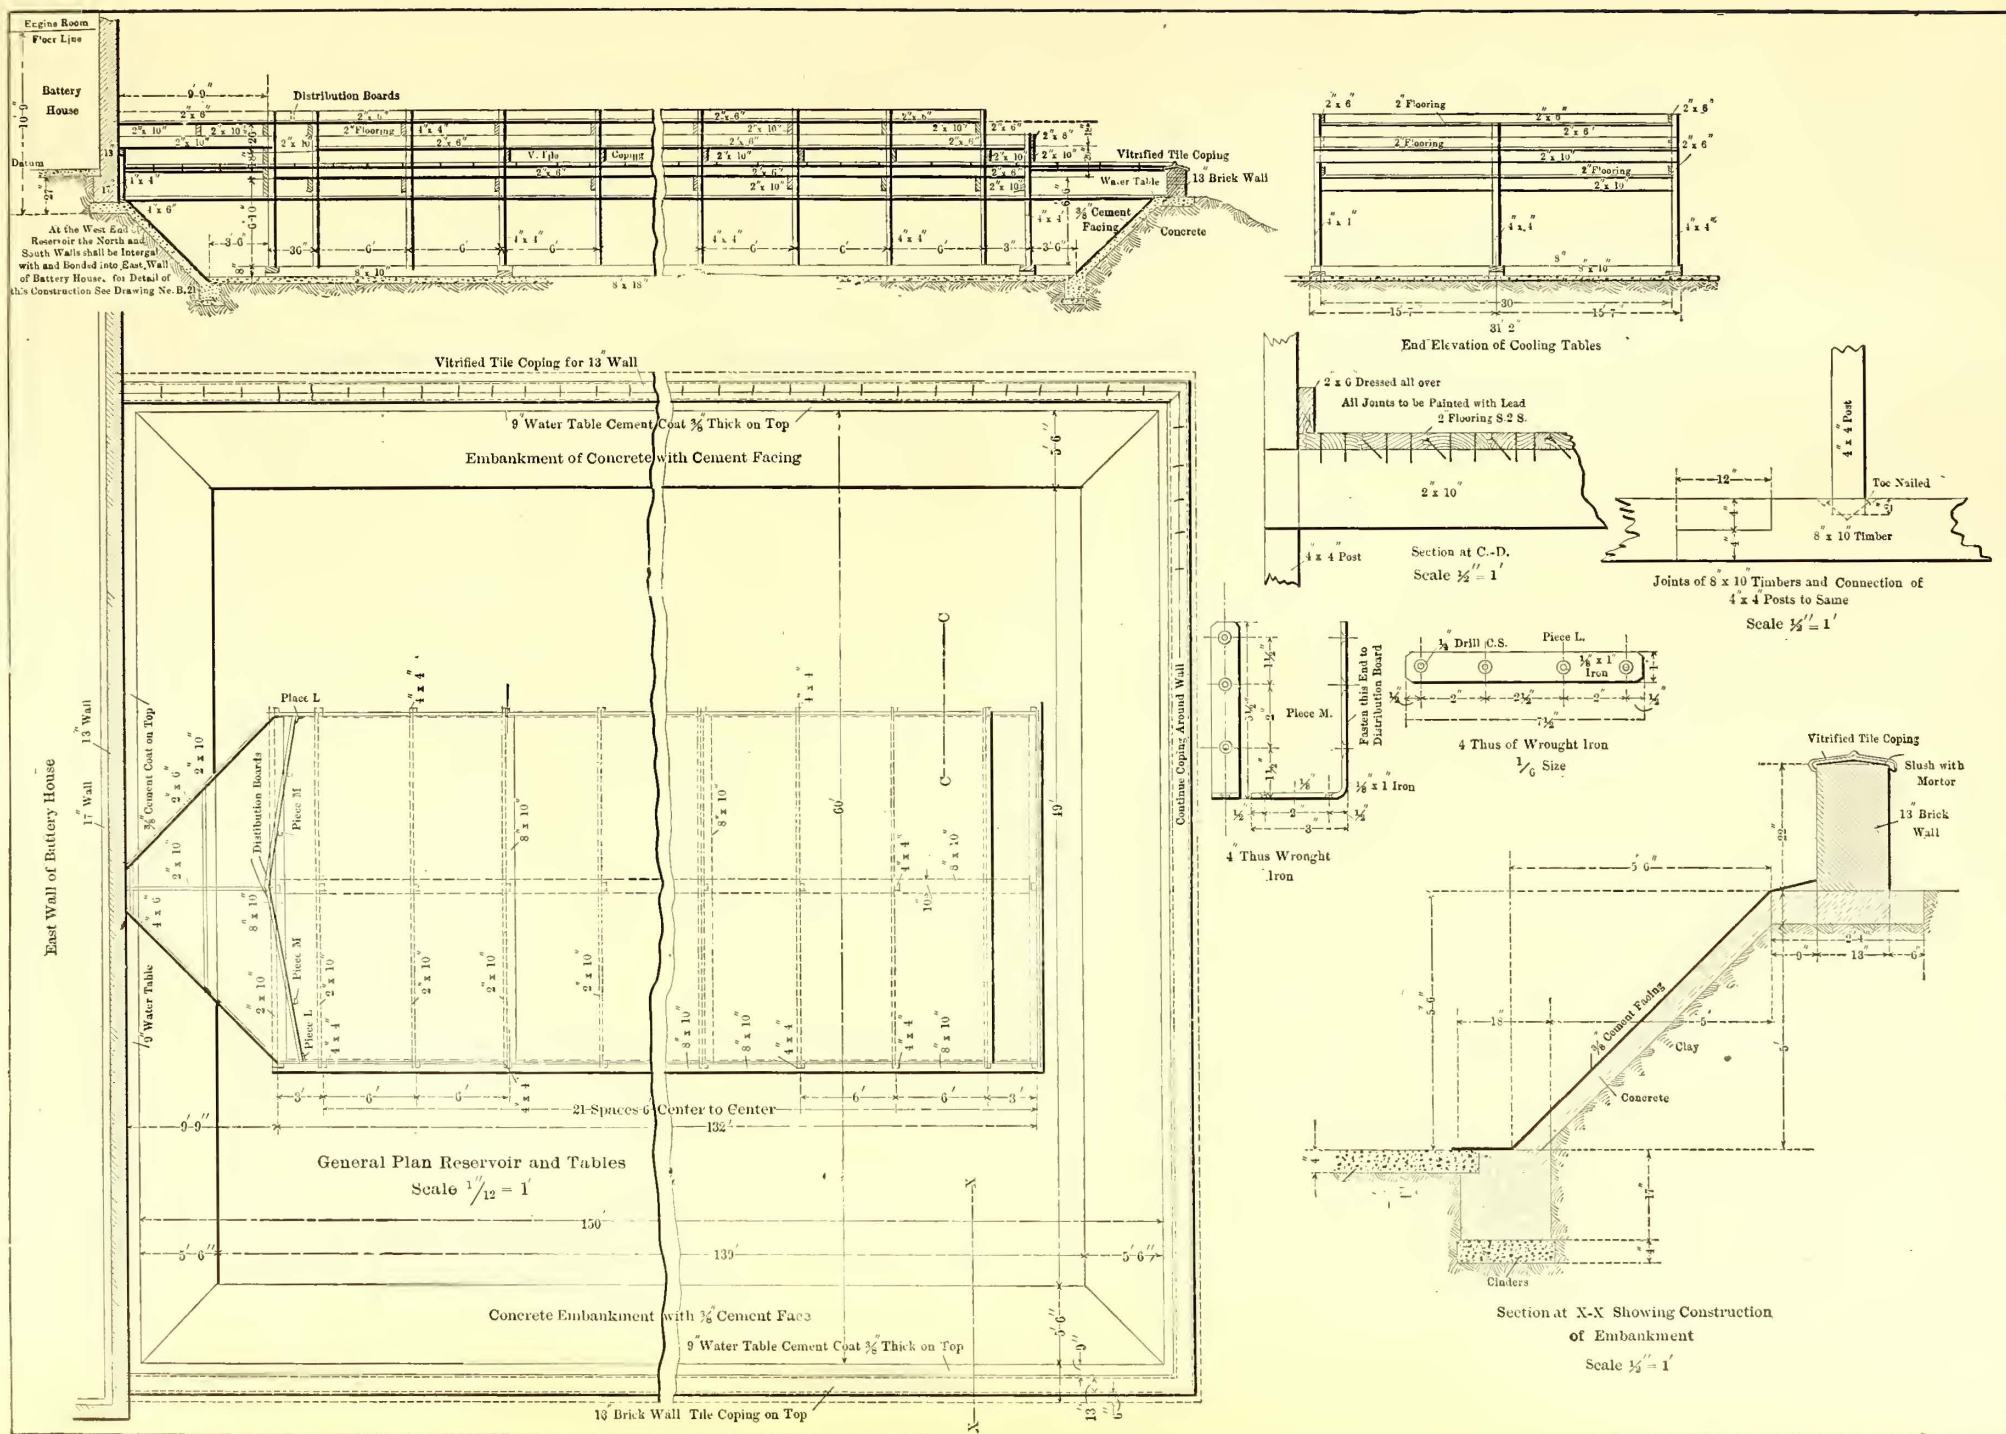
SECTIONS, PLAN AND DETAILS OF COOLING TABLE AND POND
